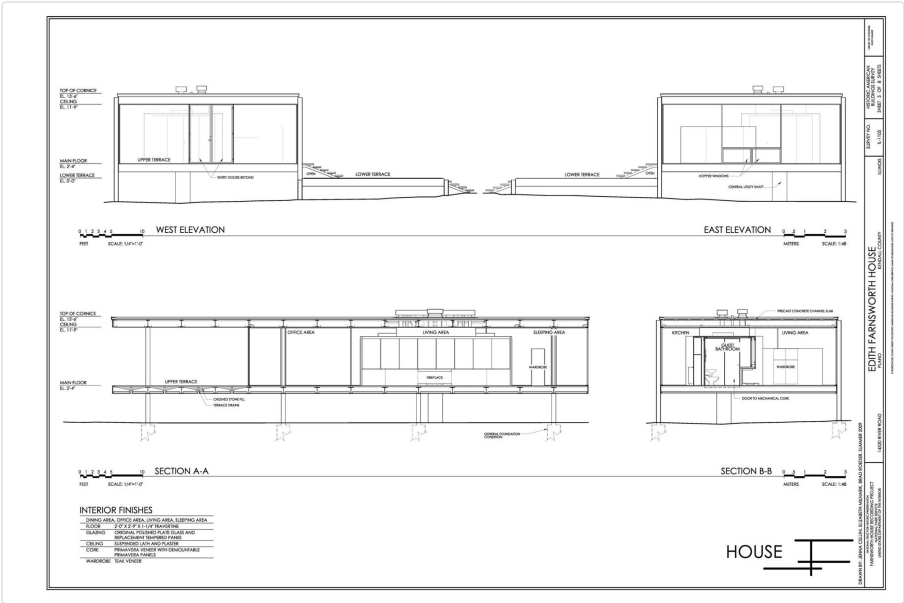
Drafting at its best, and at its limit. West and east elevations with sections A-A and B-B of the Farnsworth House, drawn in CAD in 2009. The work is precise, but plan, sections and elevations remain separate drawings: the 2D detour that the industry took while modelling tools waited for their moment.
